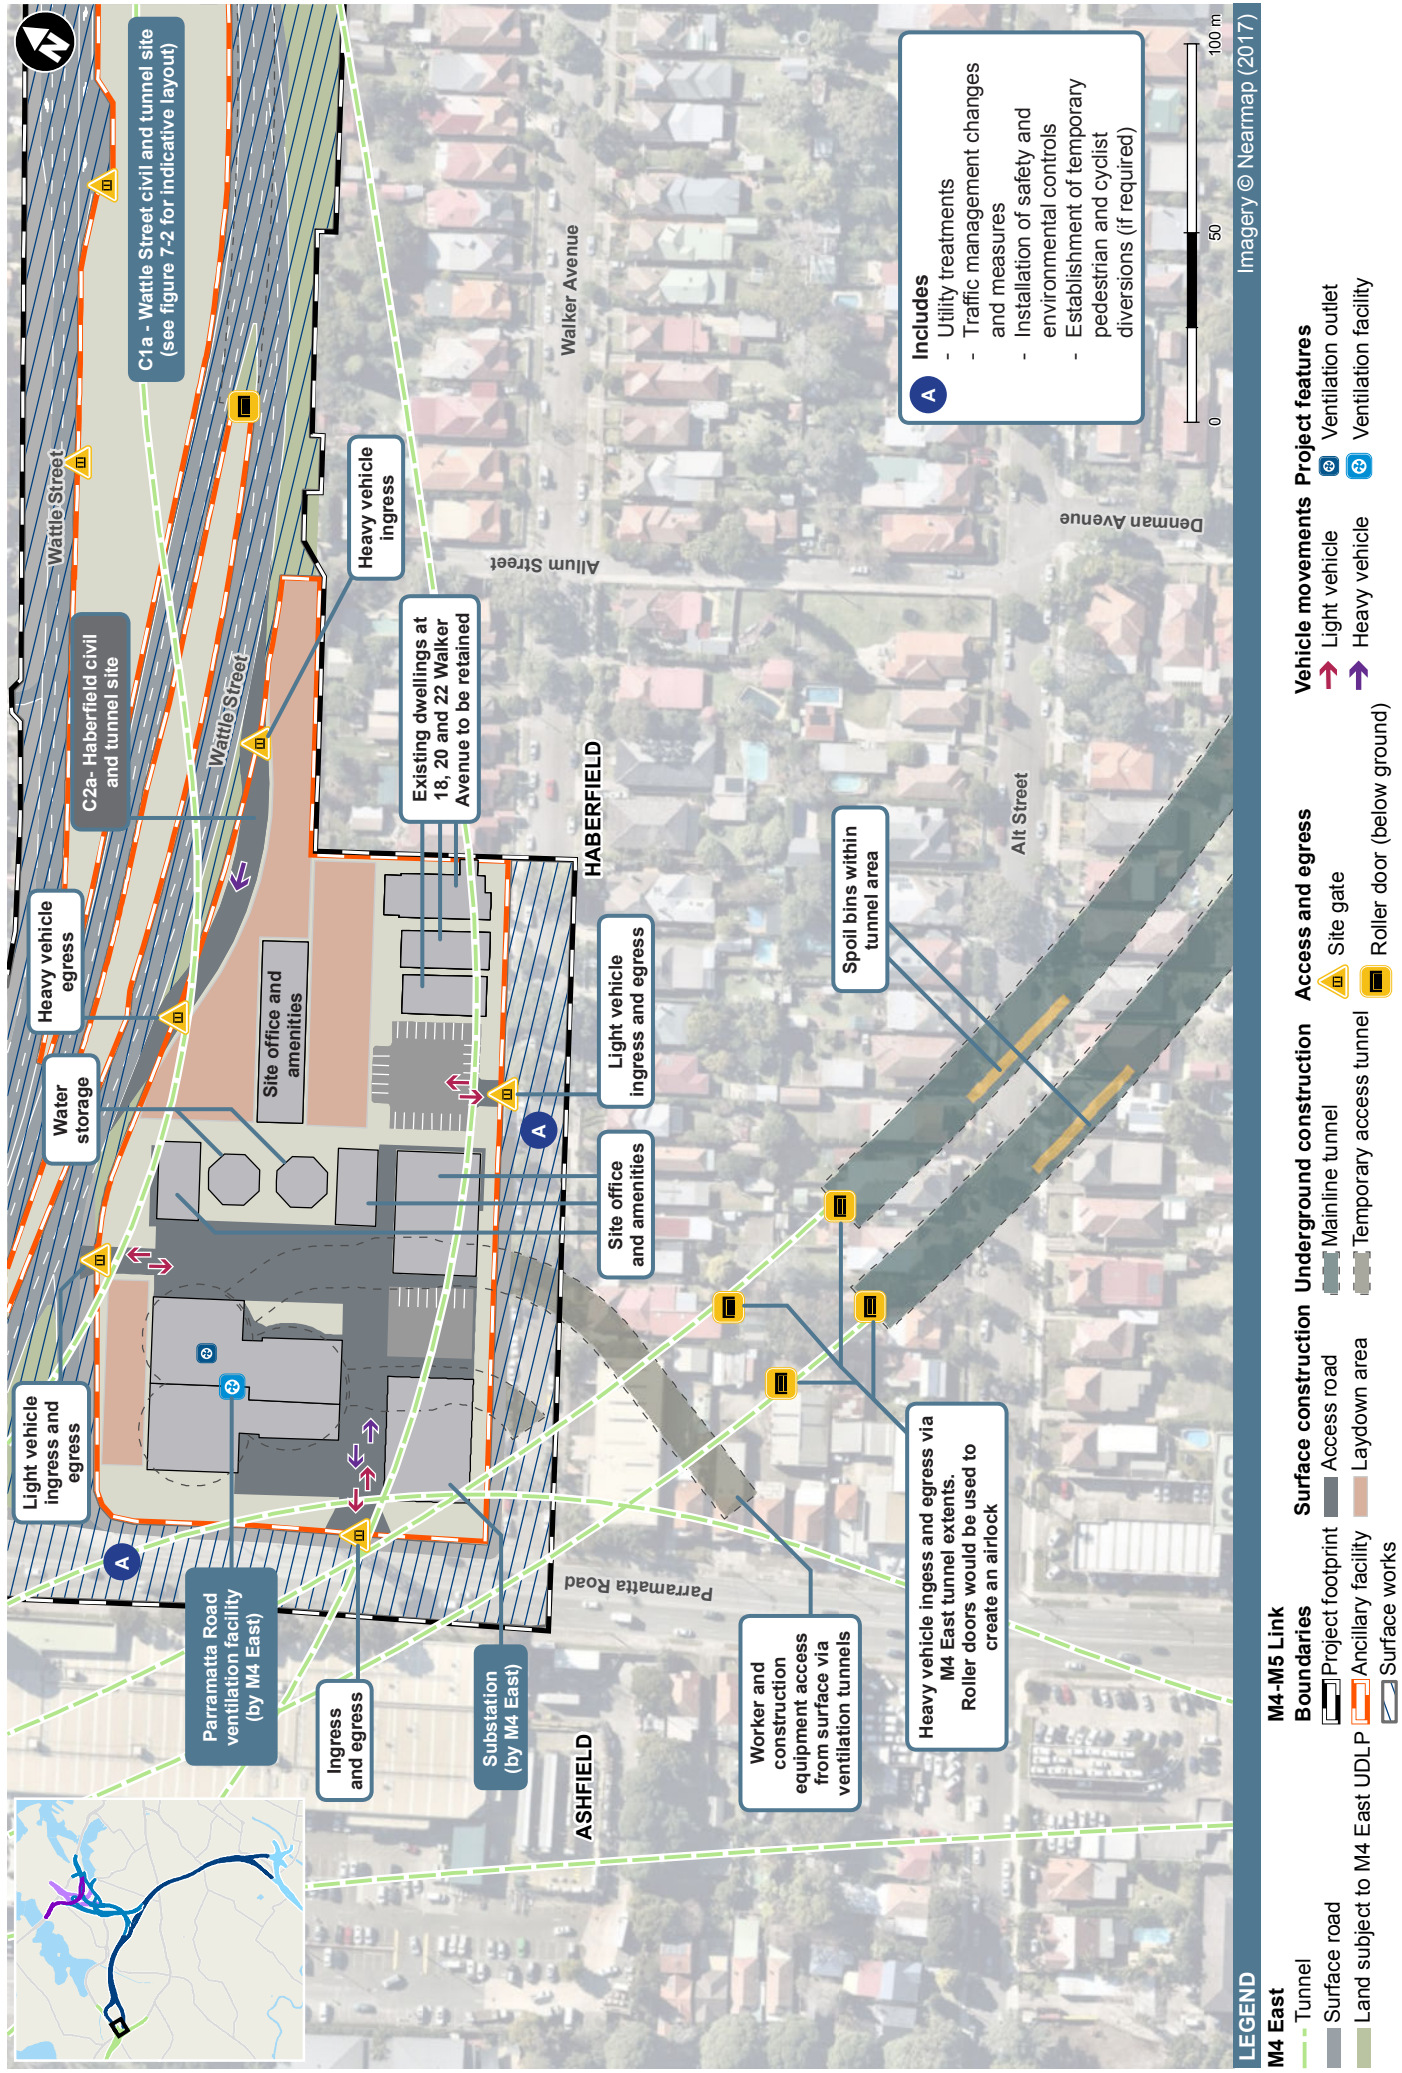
Indicative Haberfield civil and tunnel site (C2a) layout
